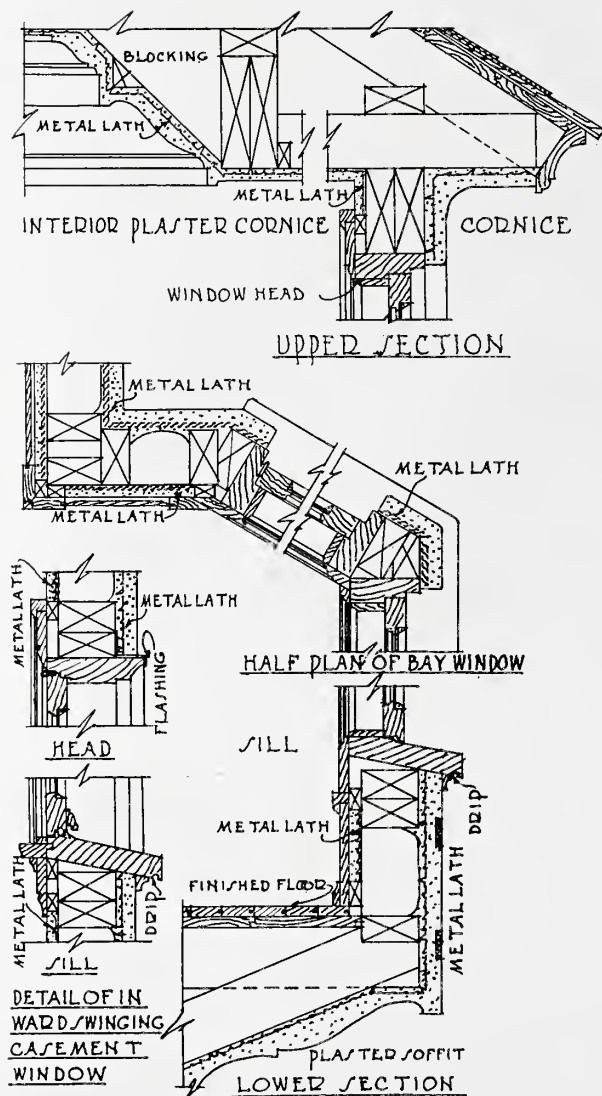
DETAILS OF BAY WINDOW CONSTRUCTION. BACK PLASTERED TYPE.
